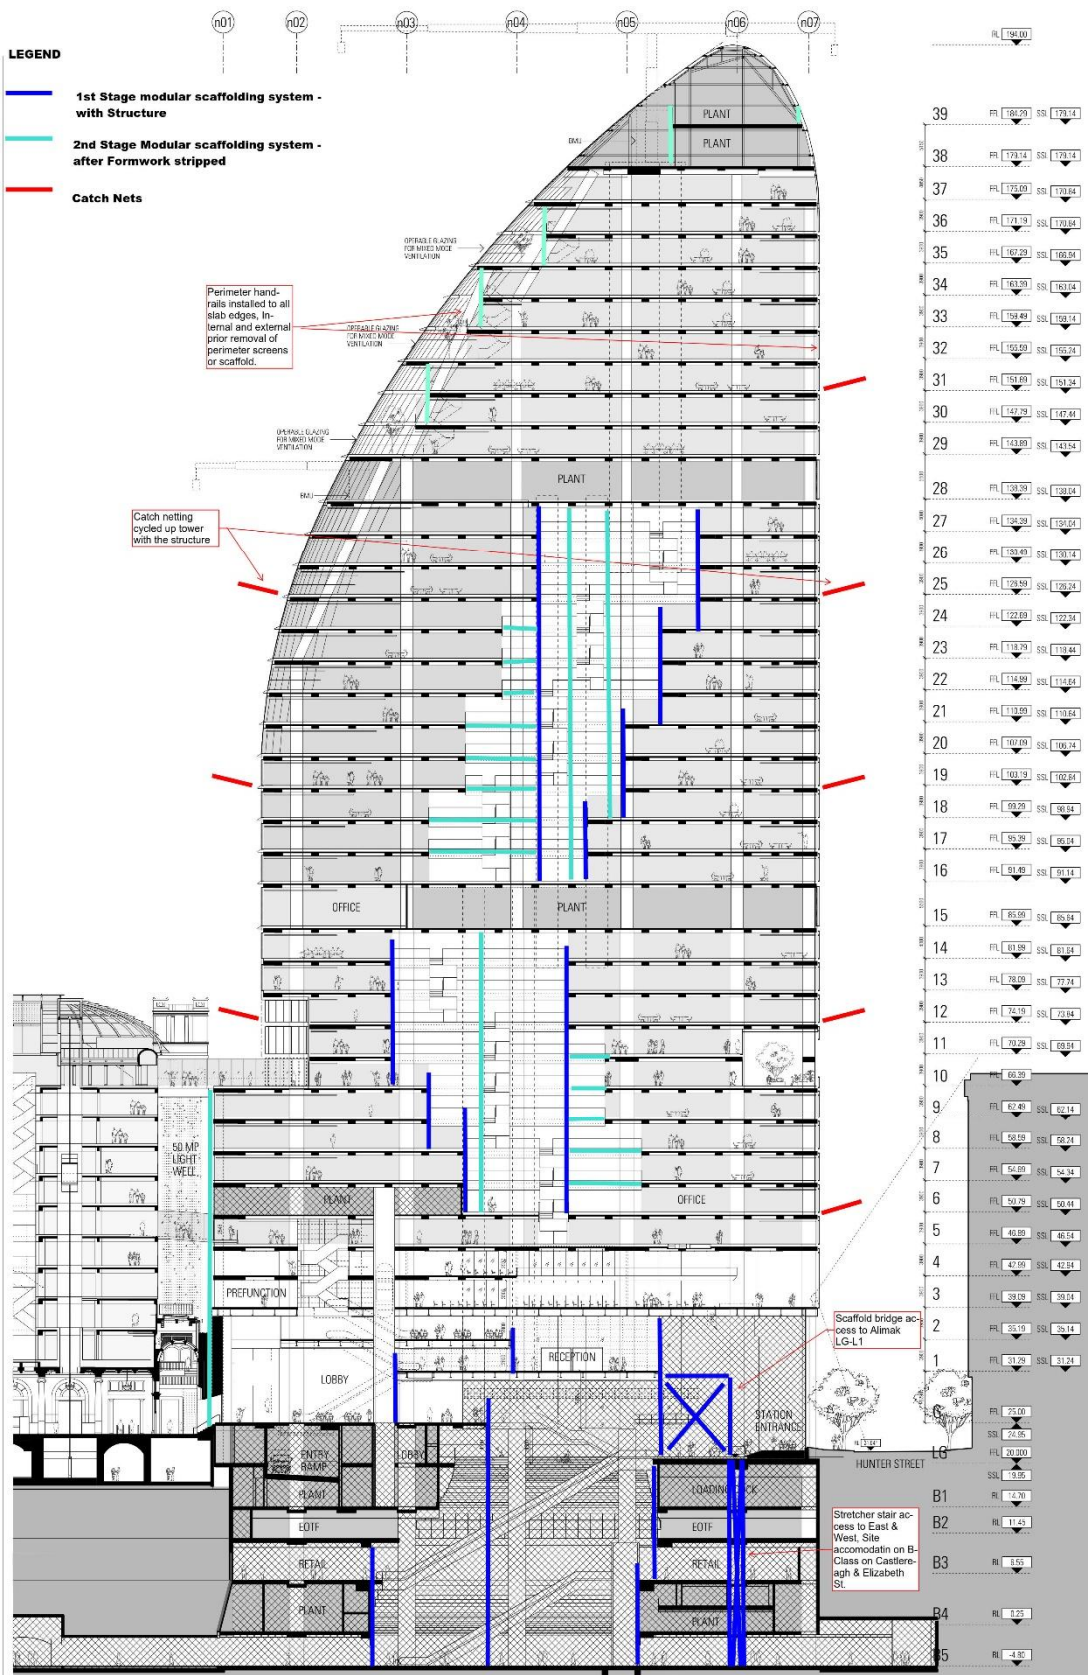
North Tower Perimeter Protection Post-Structure Completion
